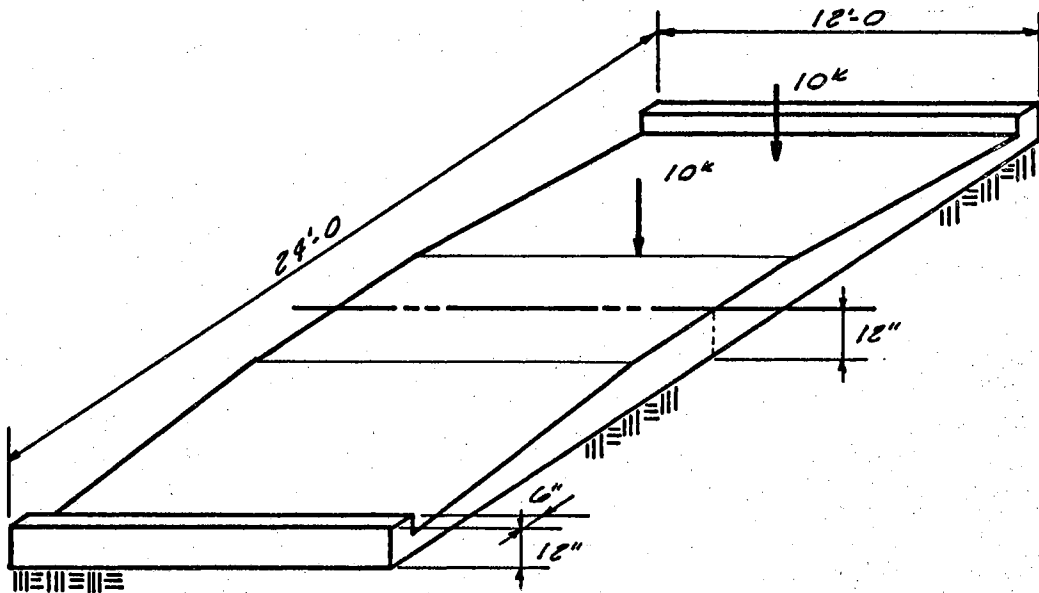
Slab Configuration and Deformation Contour Lines for an Edge Stiffened Concrete Pavement Slab
